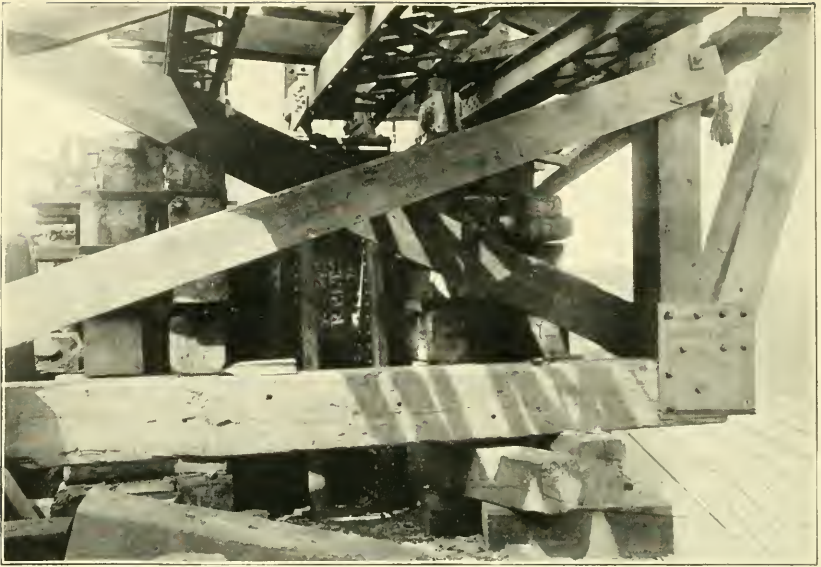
PERMANENT STEEL PEDESTAL SUPPORT FOR CENTER TRUSS.
